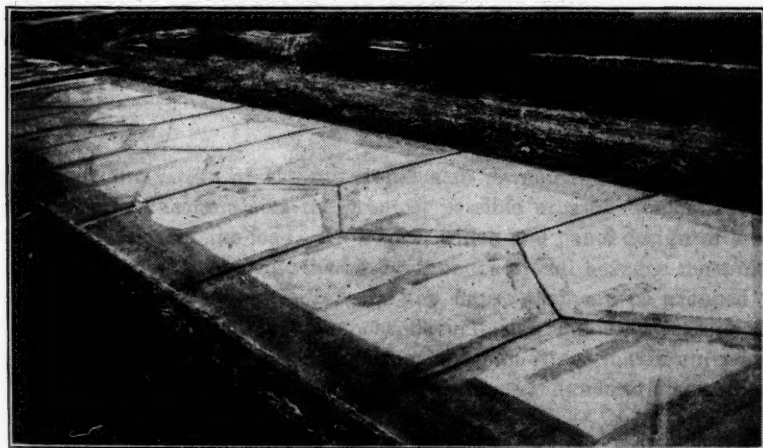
VIEW OF FINISHED STREET BEFORE TRIMMING OF EXPANSION JOINTS.
